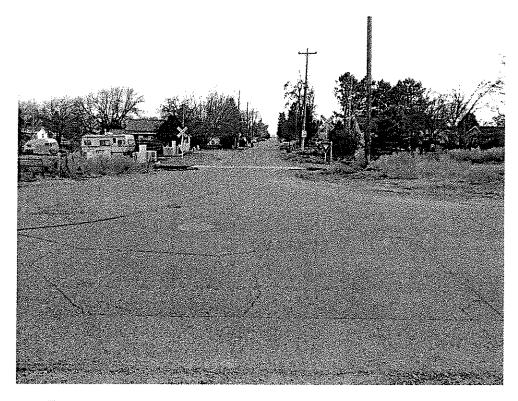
Looking South from the Peckham Road & Friends Road Intersection
